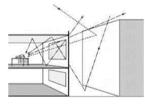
Reflected natural outdoor lighting from the project site onto the building's openings
